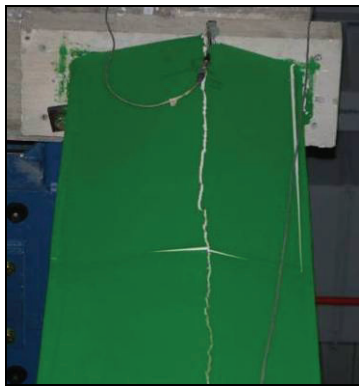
Damage in Gypsum Board on Outside Face of Transverse Wall
